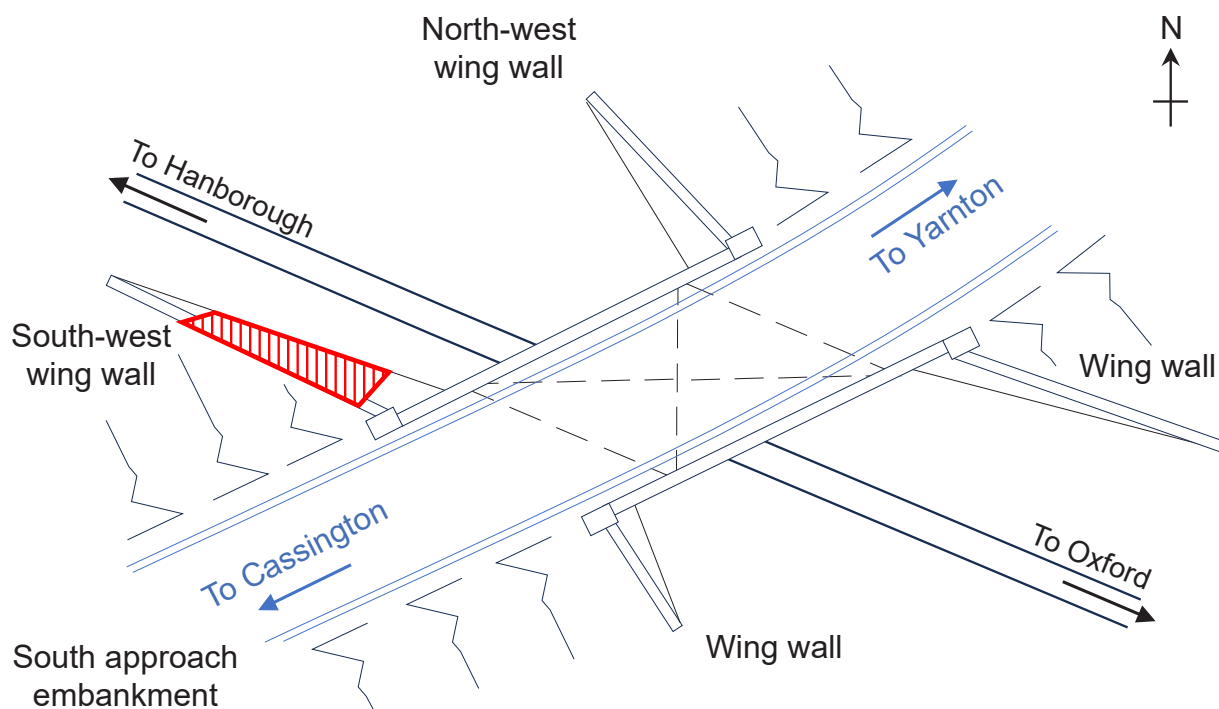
Bridge layout sketch showing the wing walls and south approach embankment. The section of the south-west wing wall that collapsed is highlighted in red.
